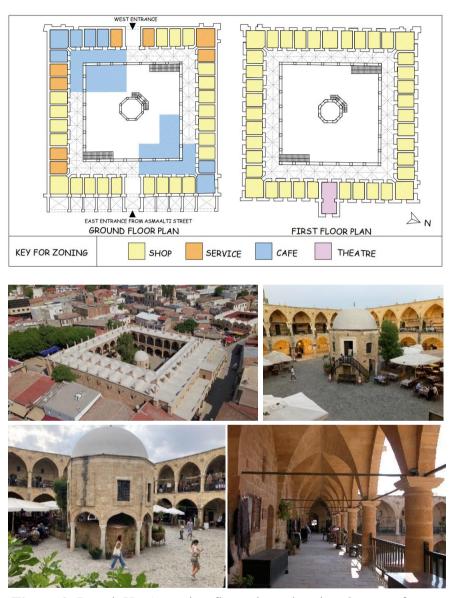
Büyük Han's zoning floor plans showing the use of spaces after the adaptive reuse and photos of the current condition (Author, 2023).
